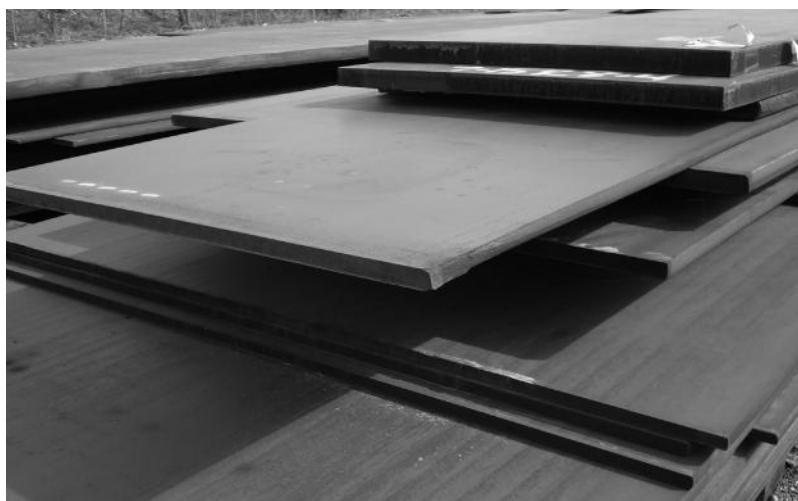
Most steel bridges start out as steel plate, which is cut, fitted, and welded into final bridge components.
